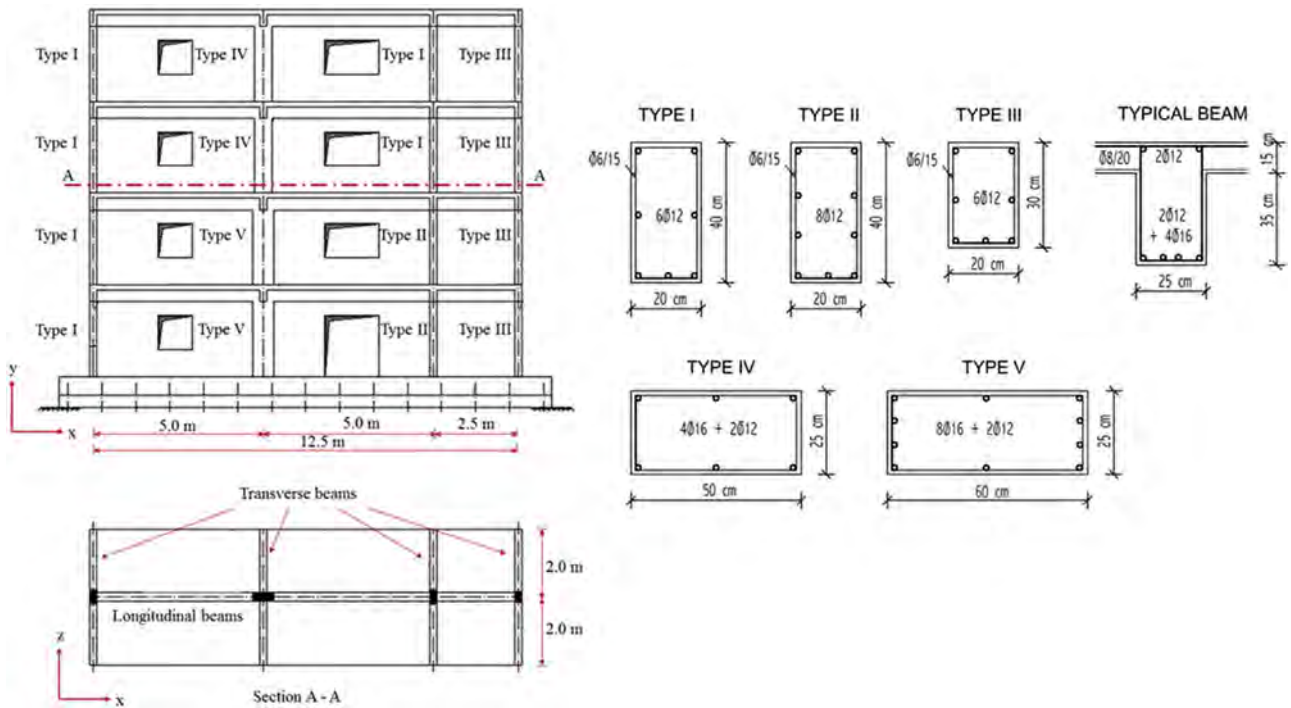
Plan layout and reinforcement detailing of ICONS frame.
